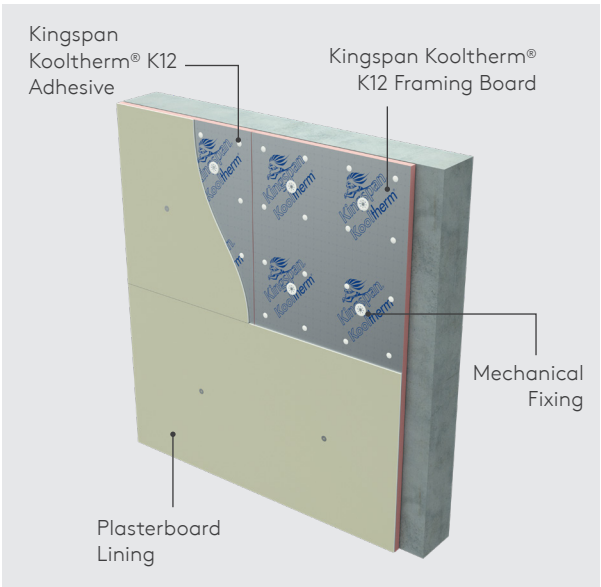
Kingspan Kooltherm® K12 Framing Board Mechanically Fixed to the Concrete Wall, with the plasterboard adhered to the Framing Board using Kingspan Kooltherm® K12 Adhesive.
